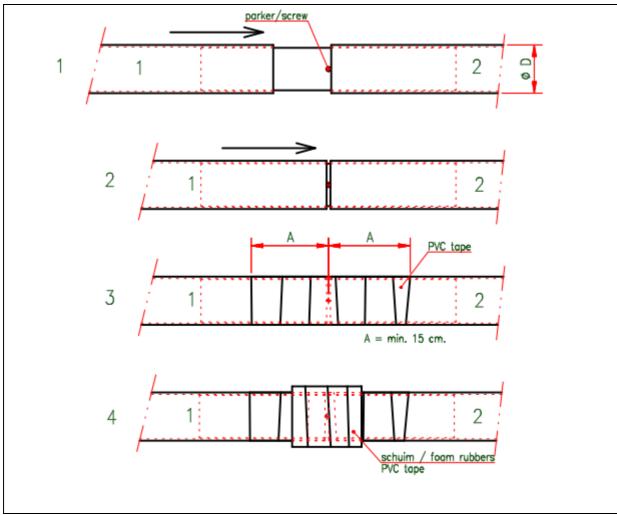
Fig. I circular tube composition consisting of tube; coupling tube; tape and foam rubber
